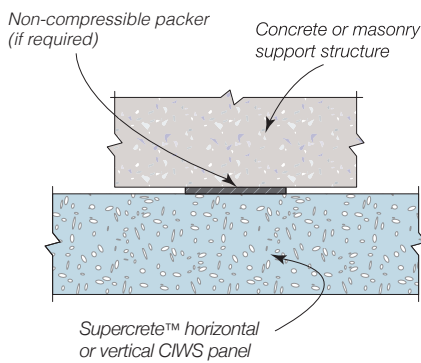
Horizontal bearing surfaces and concrete/masonry support interaction detail.
